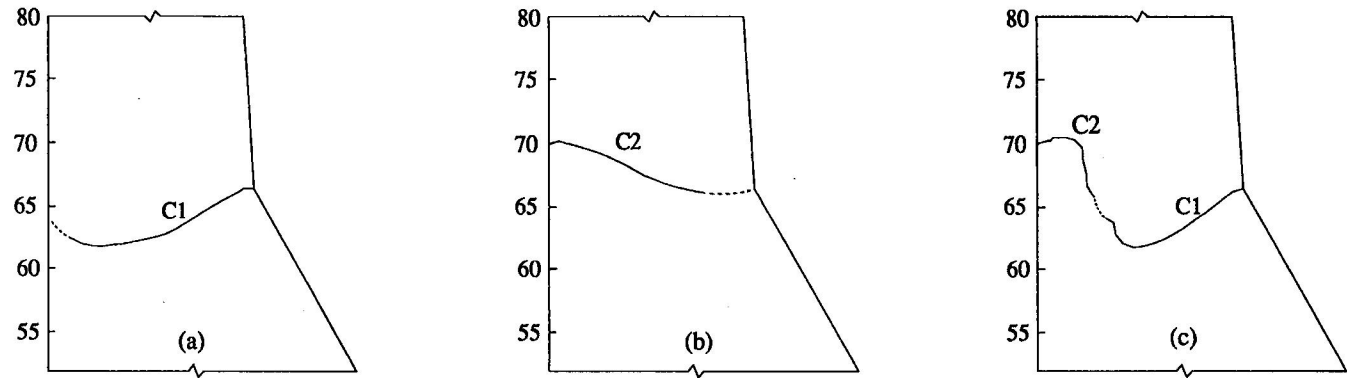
Final fracture patterns: (a) single downstream crack C1; (b) single upstream crack C2; (c) multiple cracks C1 and C2
